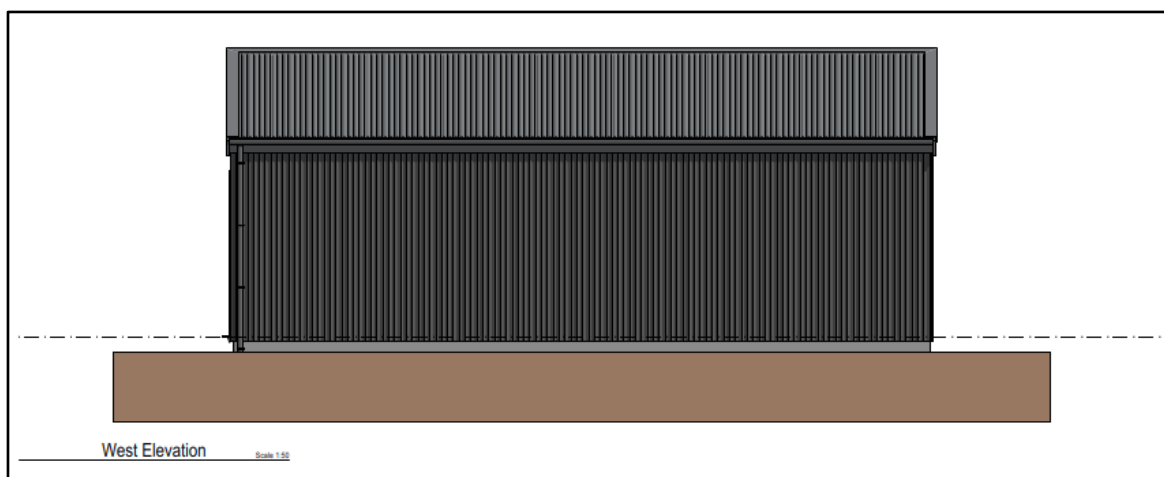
Western Elevation (Source: Extract from BC221290 approved plans).
